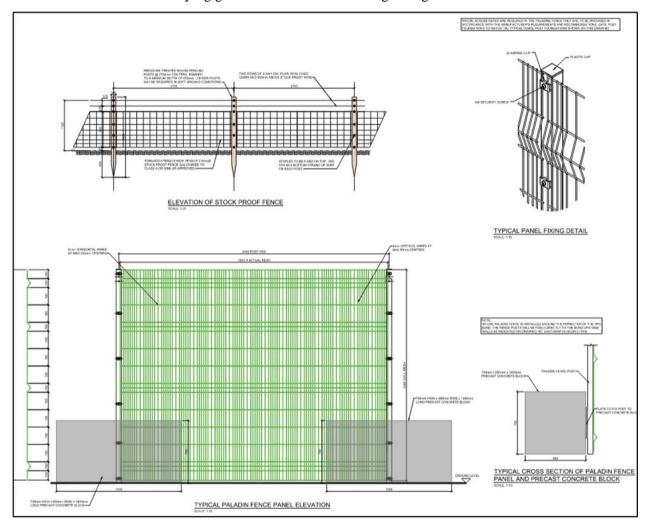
Design detail of paladin fence installation. Source Dwg. 24821-MWP-00-00-DR-C-0403 (MWP) | not to scale
